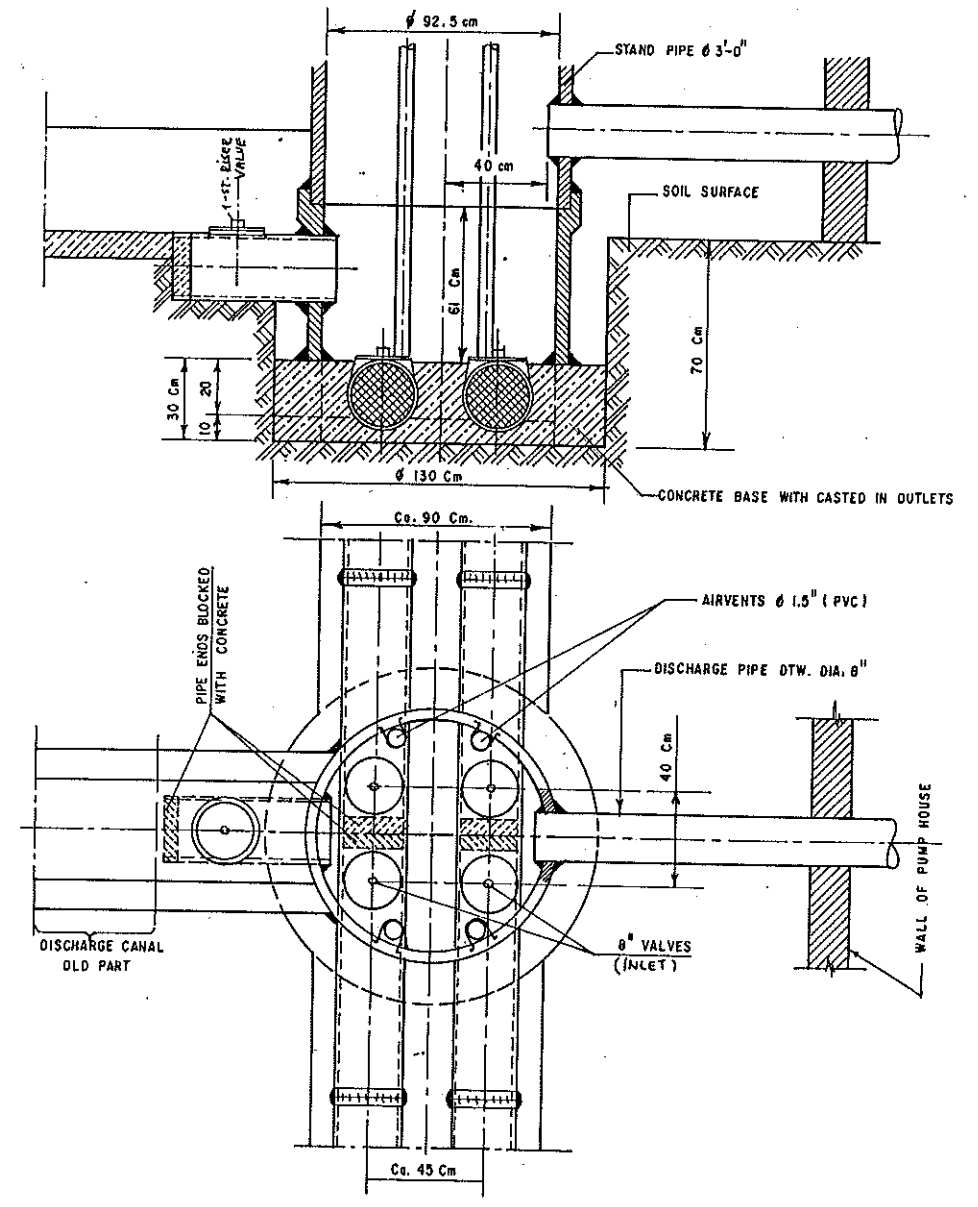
10" DIA. BURRIED PIPE SYSTEMS PUMPSTAND CONNECTION
